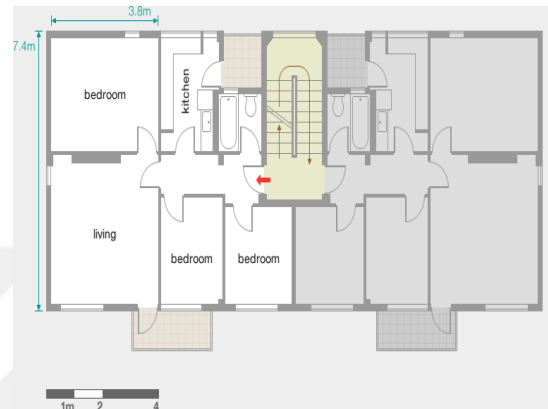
Plan layout of Maxwell Fry's London Kensal House, 1938
